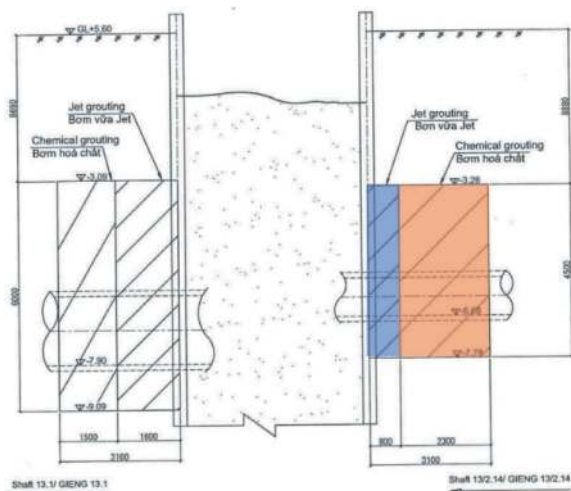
Section of Chemical grouting and Jet grouting (A-A).
